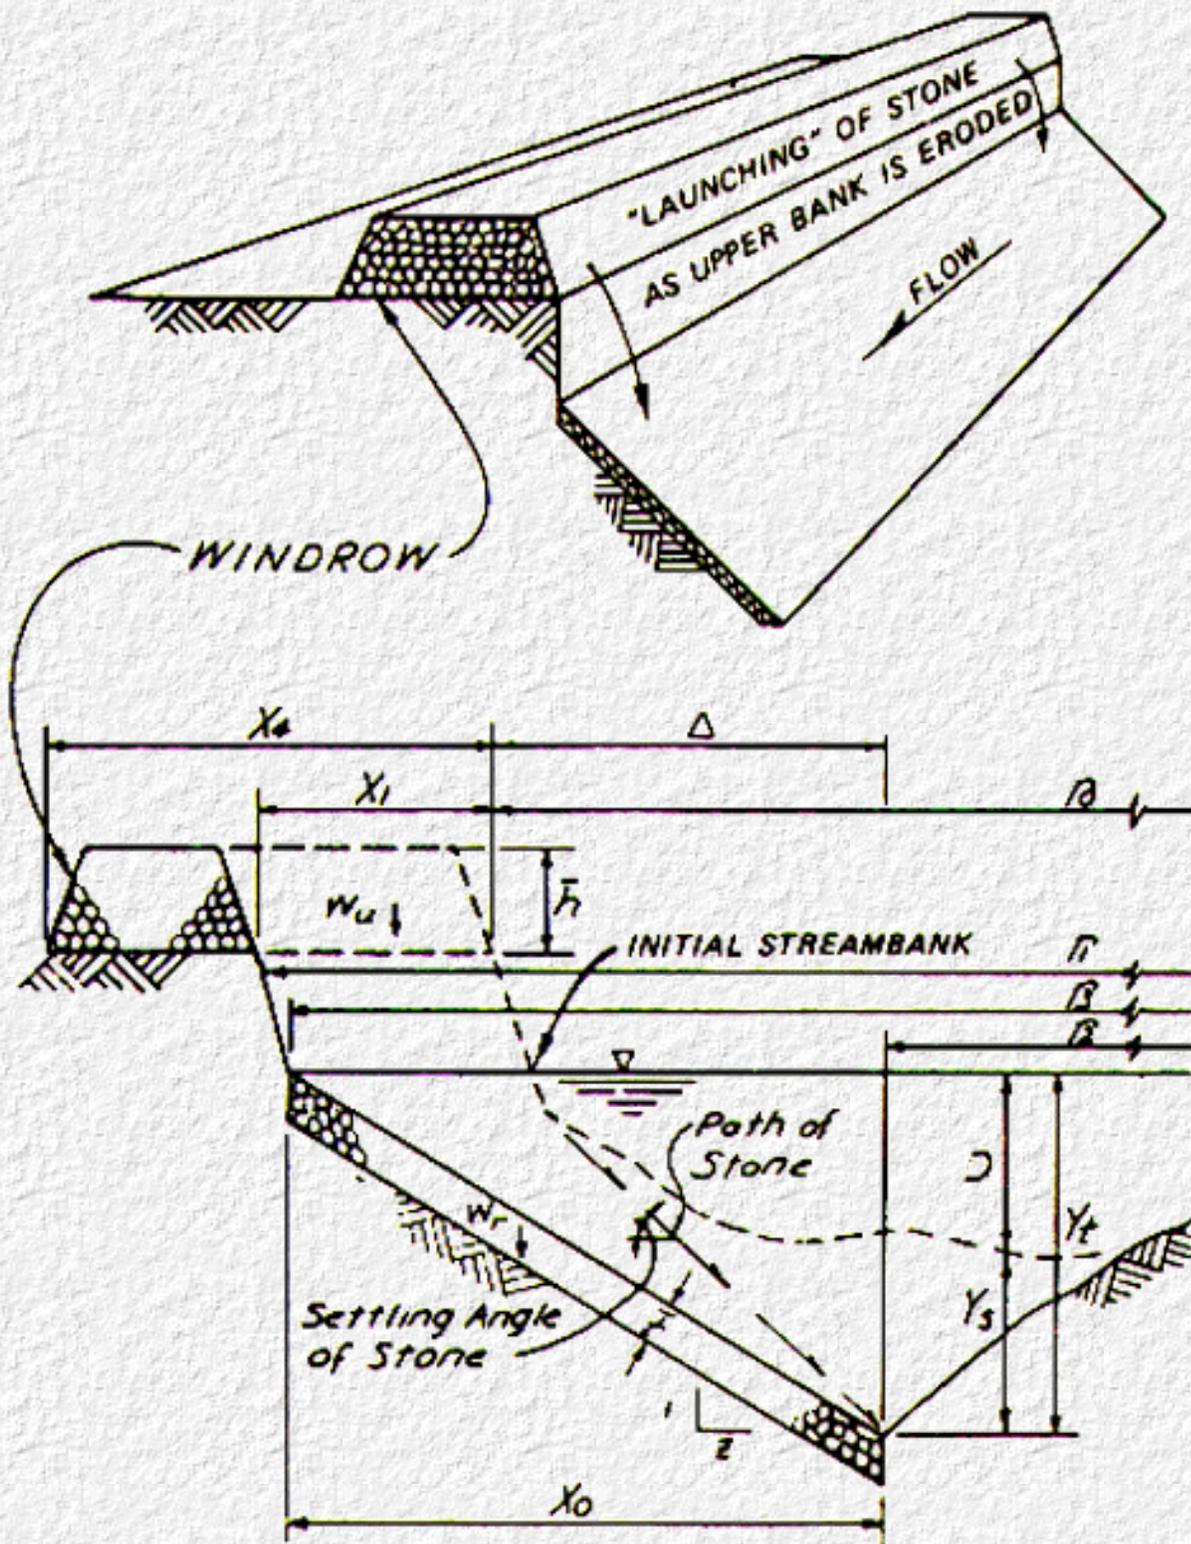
Windrow Revetment, Definition Sketch (after U.S.A. COE, 1981)
